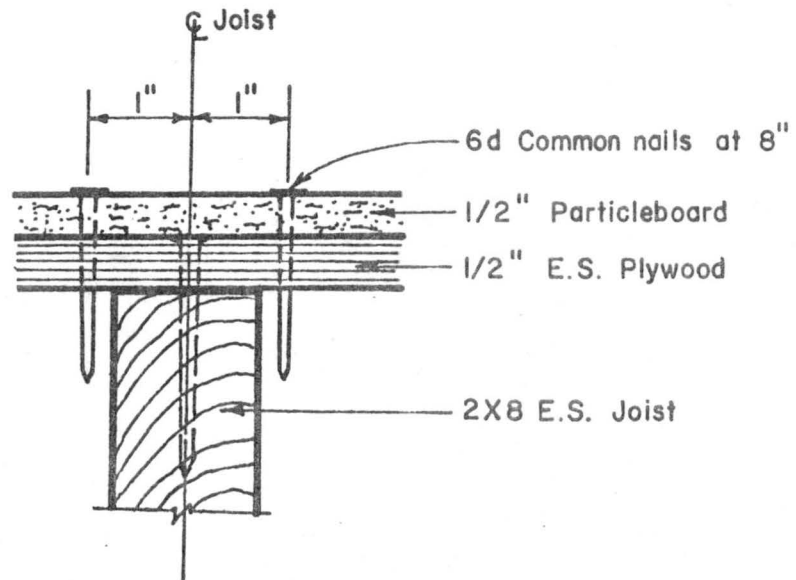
NAILING ON SPECIMEN T16-8E19.2-2
